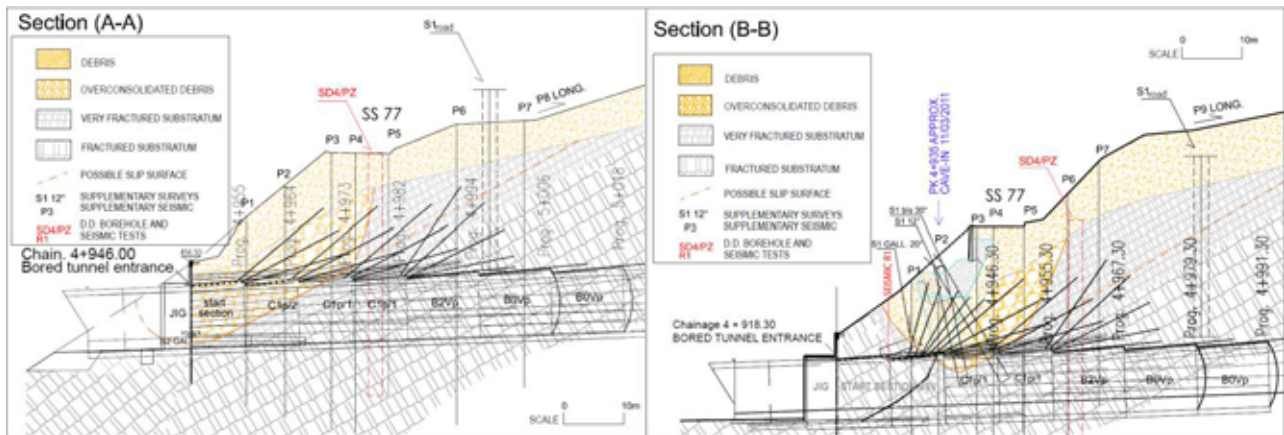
South tube longitudinal section with operations Fig.15b North tube longitudinal section with operations
